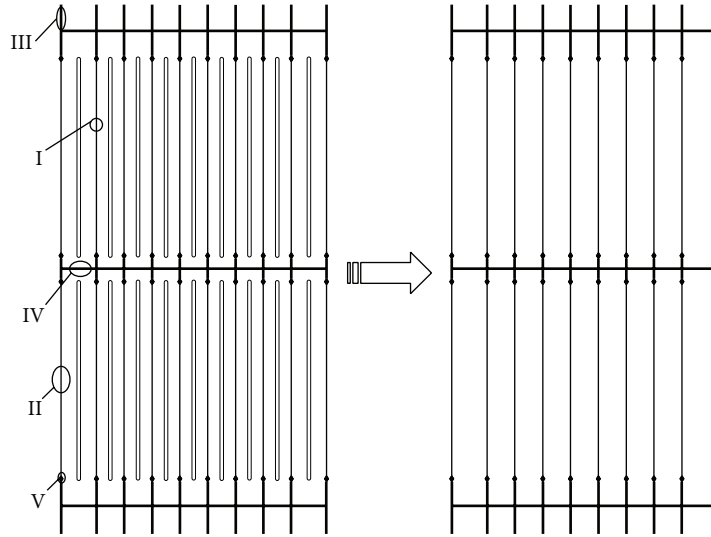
Wall-frame analysis model of the steel slit wall.
